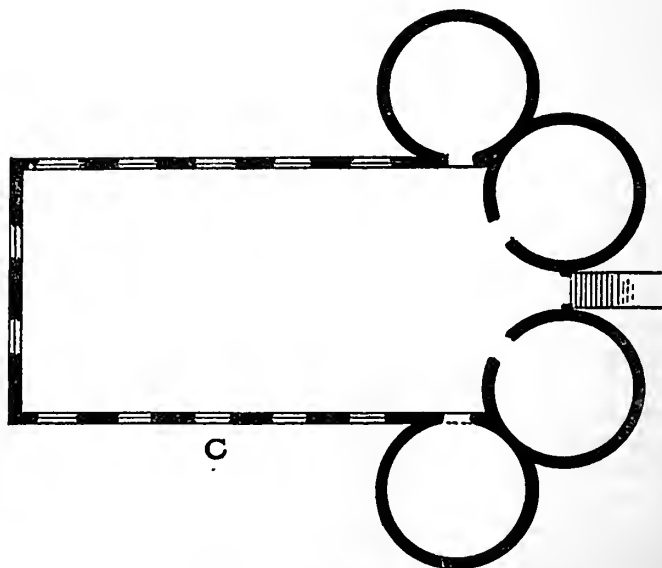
Upper Floor of Kilns and Cooling Room.
